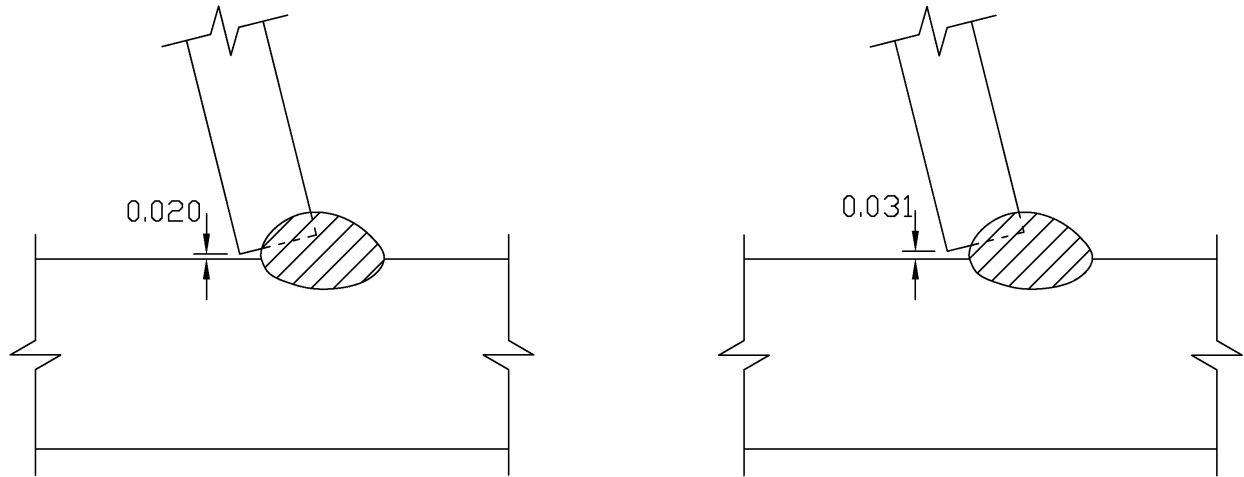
Photo. Typical saw cuts introduced at the weld roots on the OB and UB series specimens.
